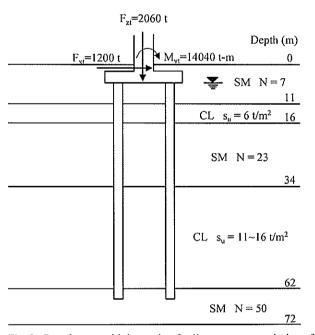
Case for a sensitivity study of soil parameters on design of pile foundation.
